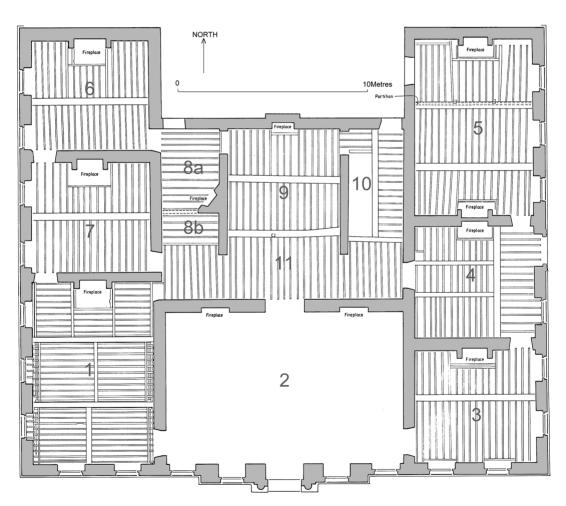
The original arrangement of the ground-floor rooms and their floor beams and joists, with the room numbers used during the restoration and in the text.
